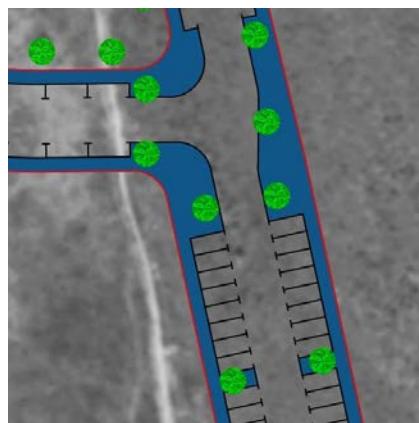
Typical view of zone with orthogonal and longitudinal parking area
